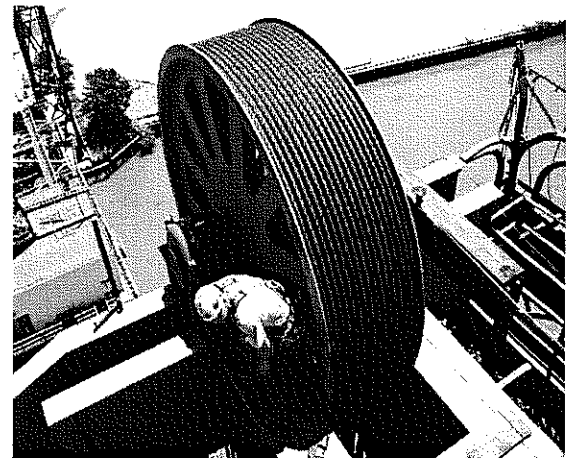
Counterweight sheaves at West 3<sup>rd</sup> Street in Cleveland, Ohio
